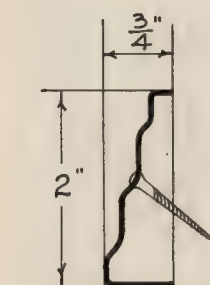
DETAIL SHOWING TYPICAL RUN OF BASE WITH FITTINGS
